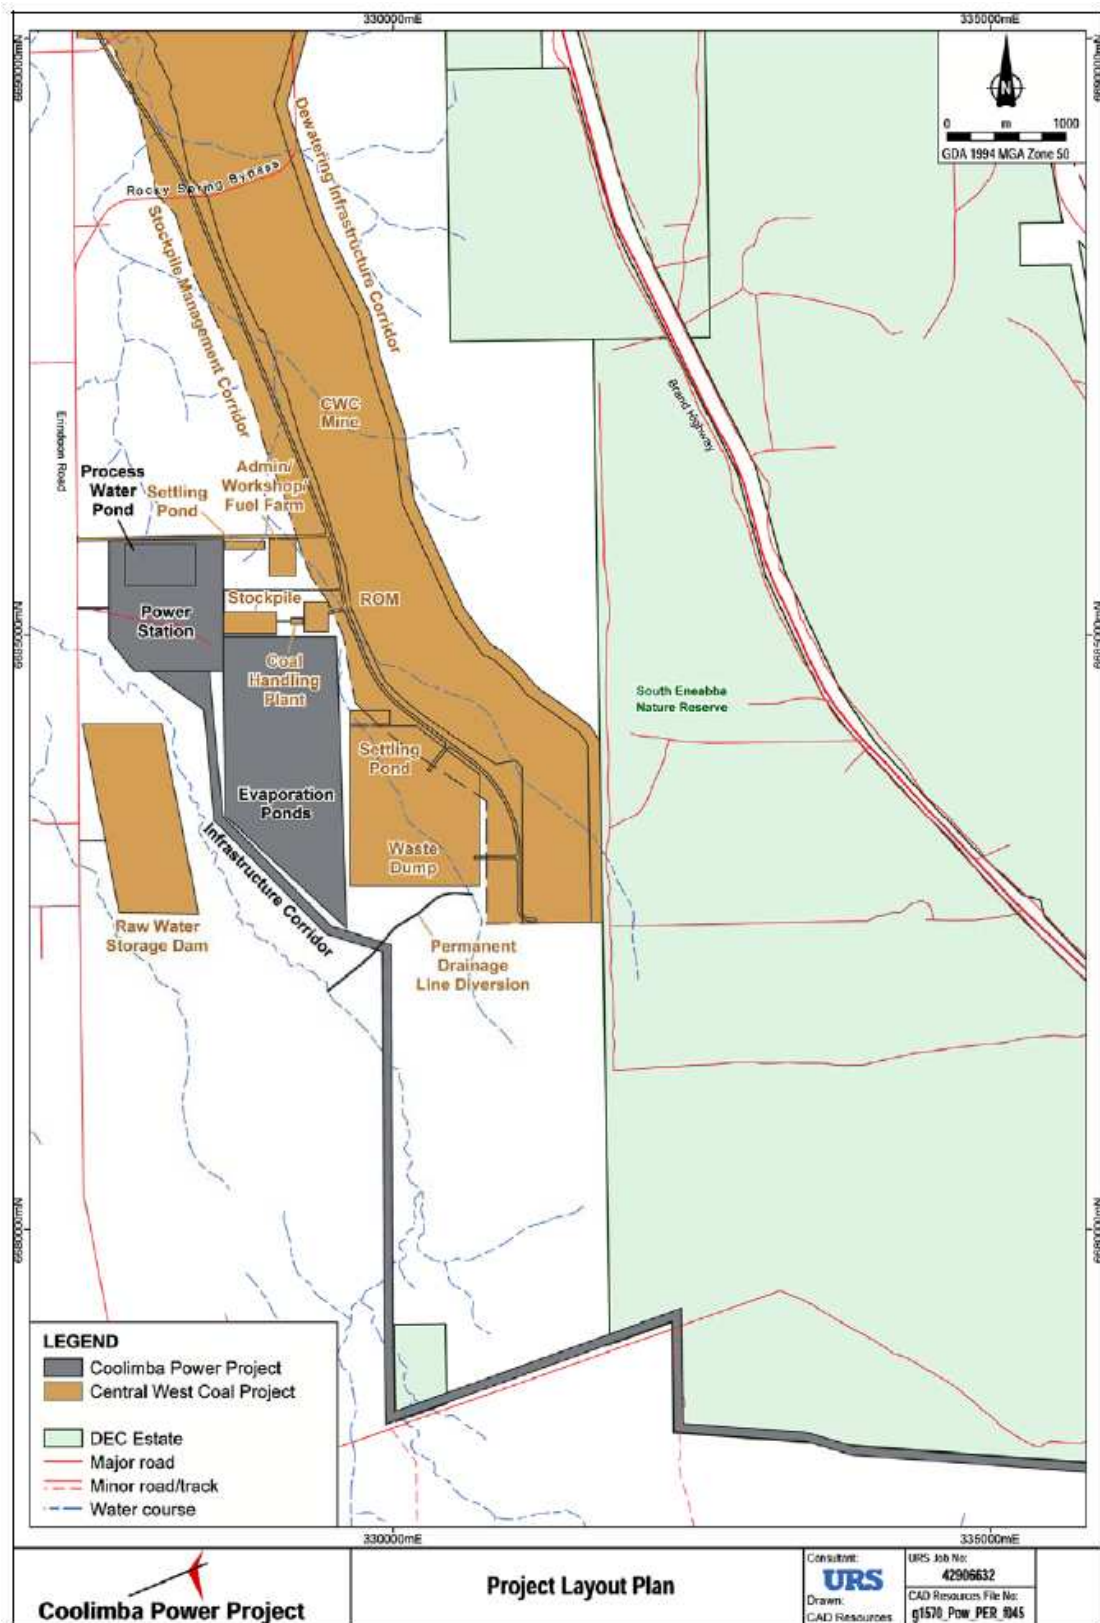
Project layout plan (Source: Figure 1-3 from URS Australia Pty Ltd, 2009)
